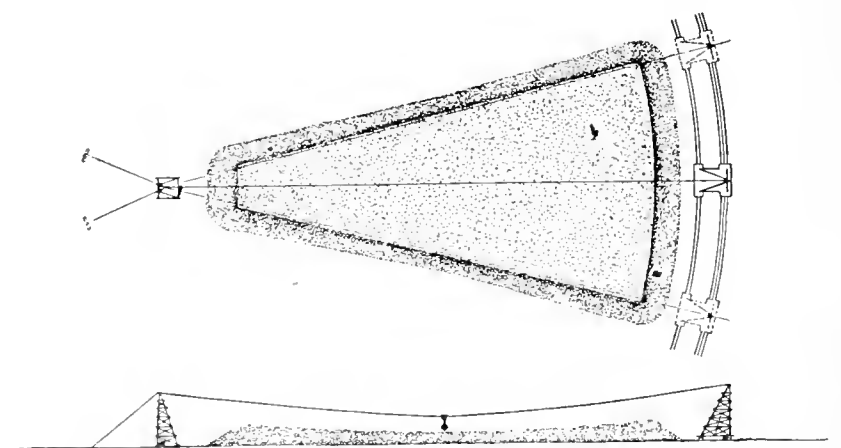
Cableway System for Handling Coal—One End Tower Fixed, the Other Movable.
